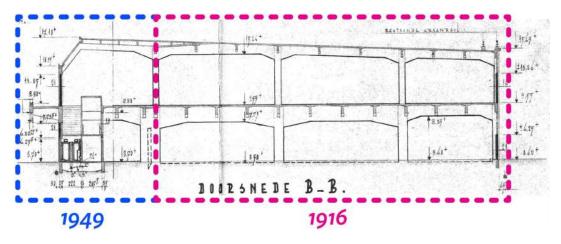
Transverse section diagram: build-up from 1916 to 1949
